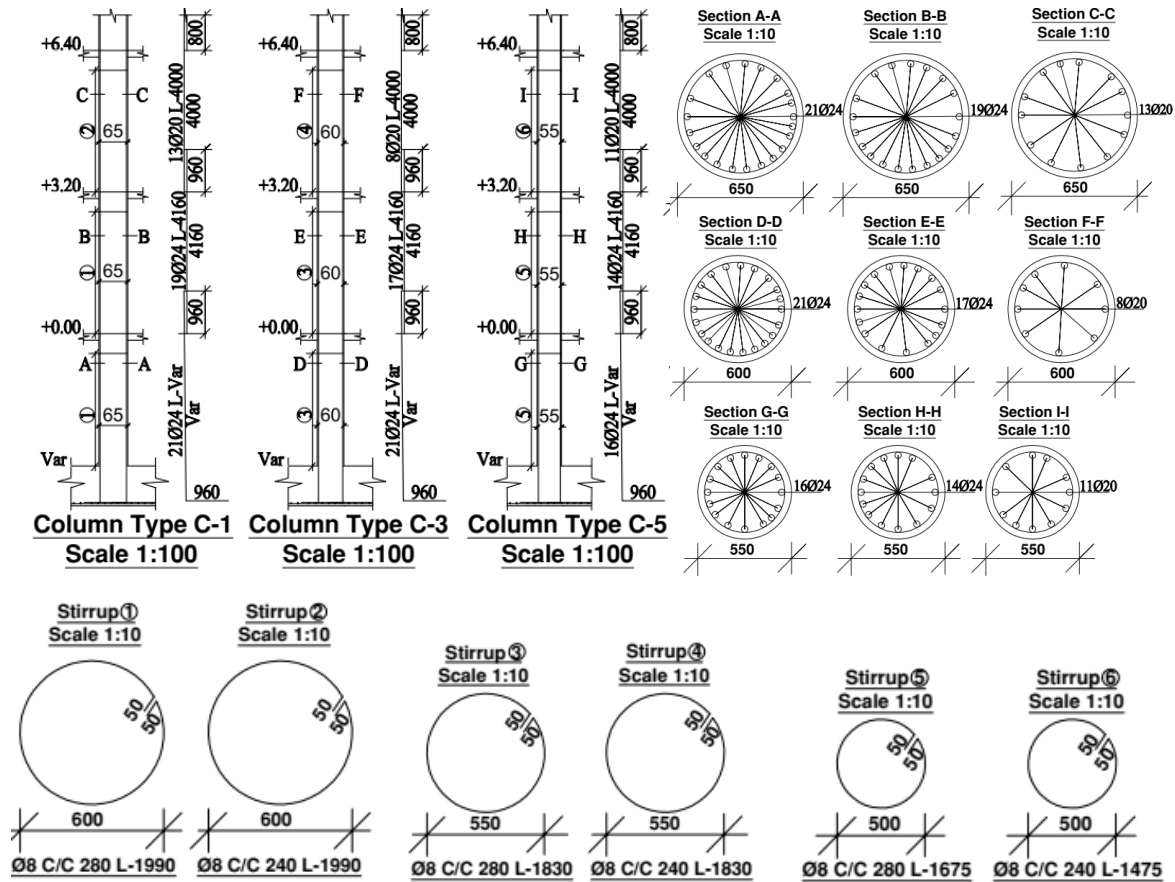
Sample column detailing for G+7 building with C-25 concrete
